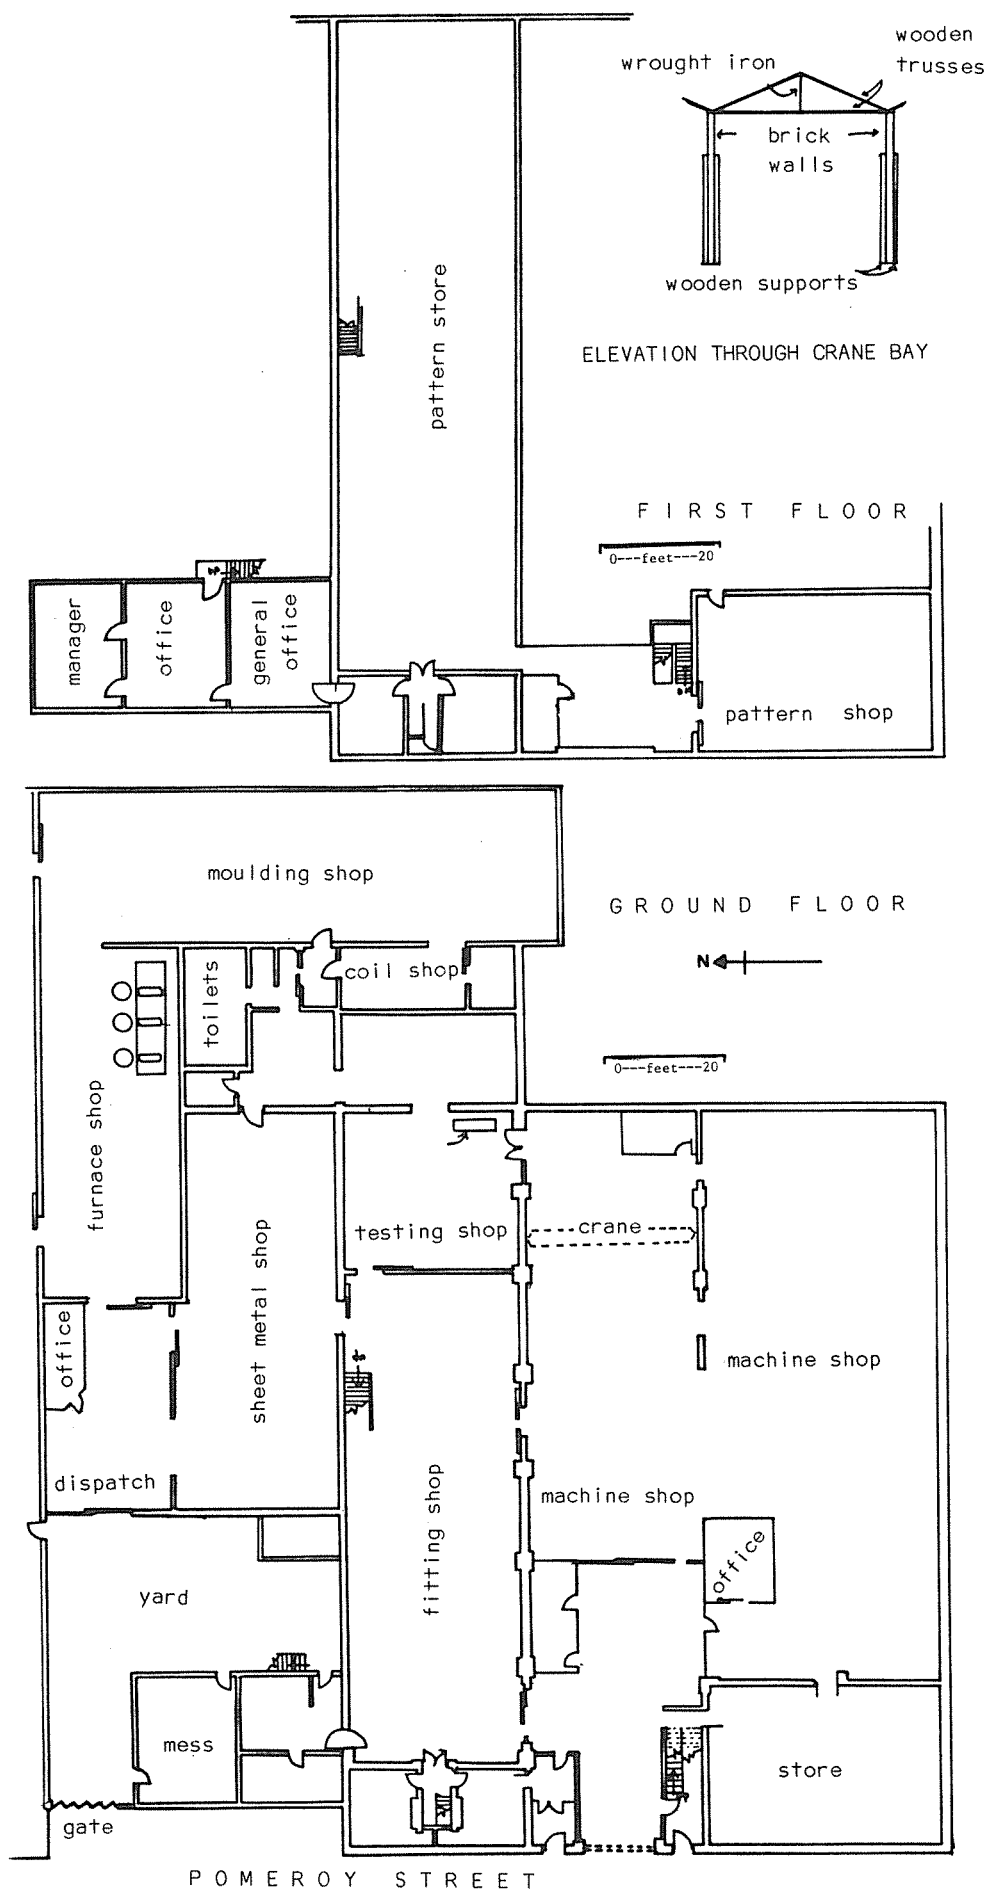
Plans of the surviving buildings in 1982 with elevations of details in the erecting shop showing the crane supports
